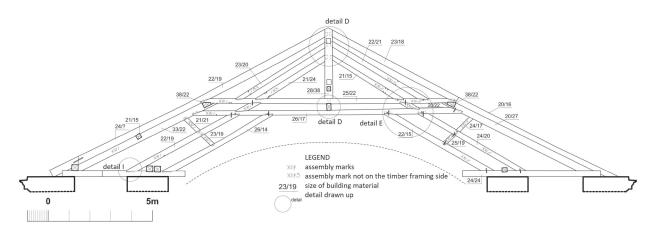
Leszno, Church of the Holy Cross, roof structure, principal rafter truss (elaborated by U. Schaaf, M. Prarat) Il. 1. Leszno, kościół św. Krzyża, więźba dachowa, wiązar pełny (oprac. U. Schaaf, M. Prarat)
